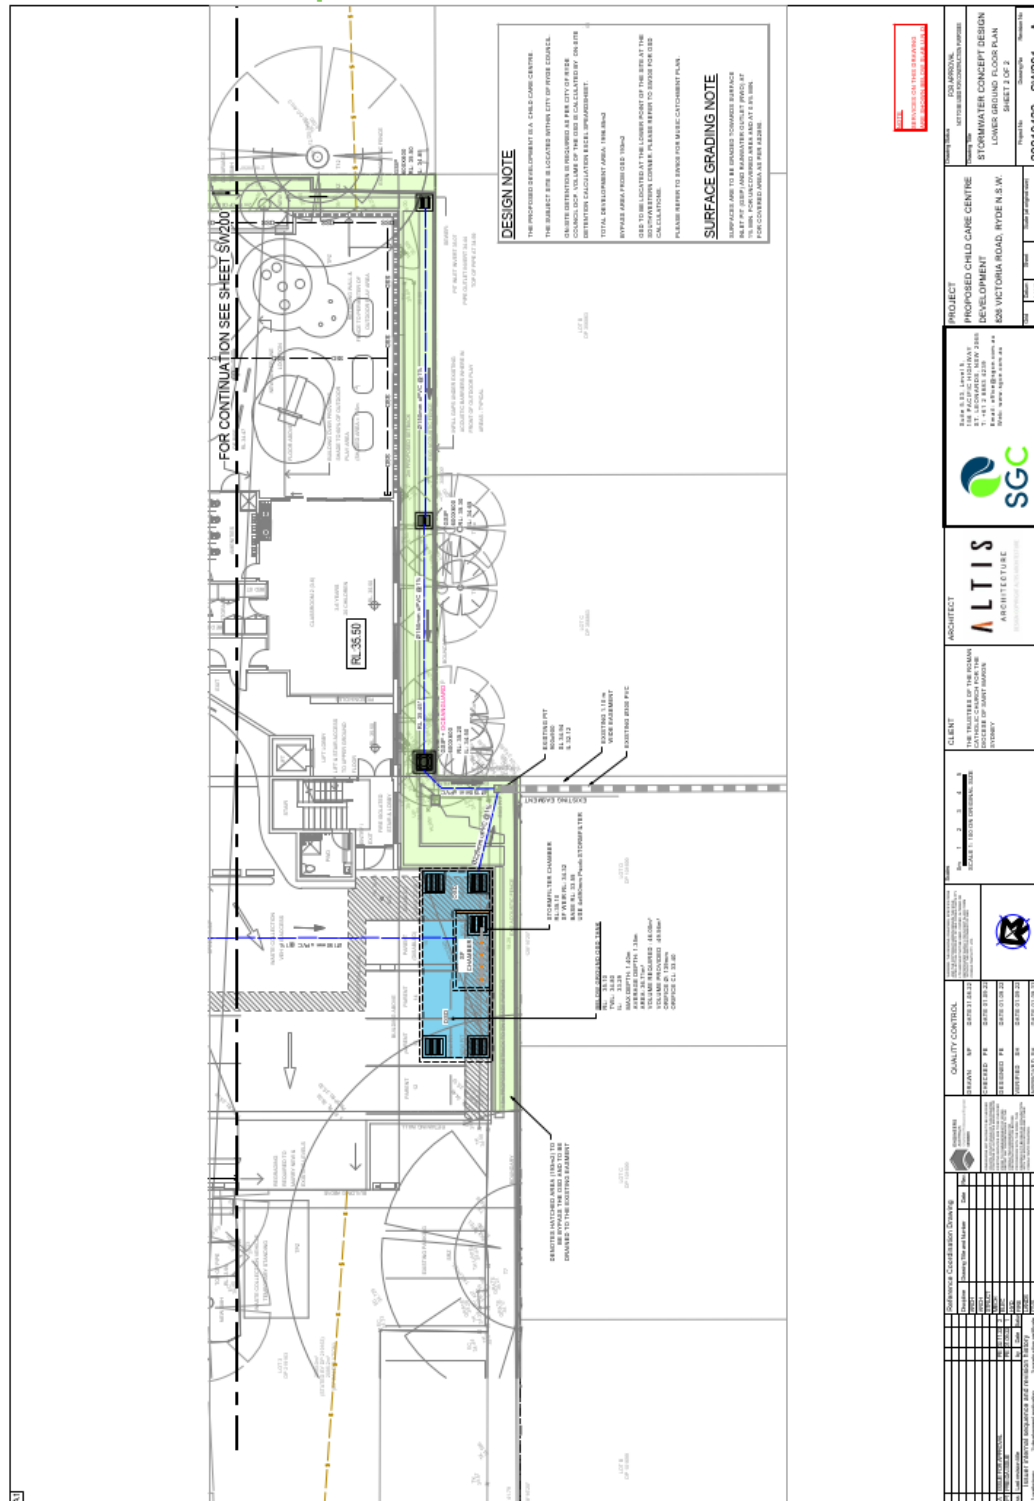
SW Concept Lower Ground Floor Plan 2 of 2
